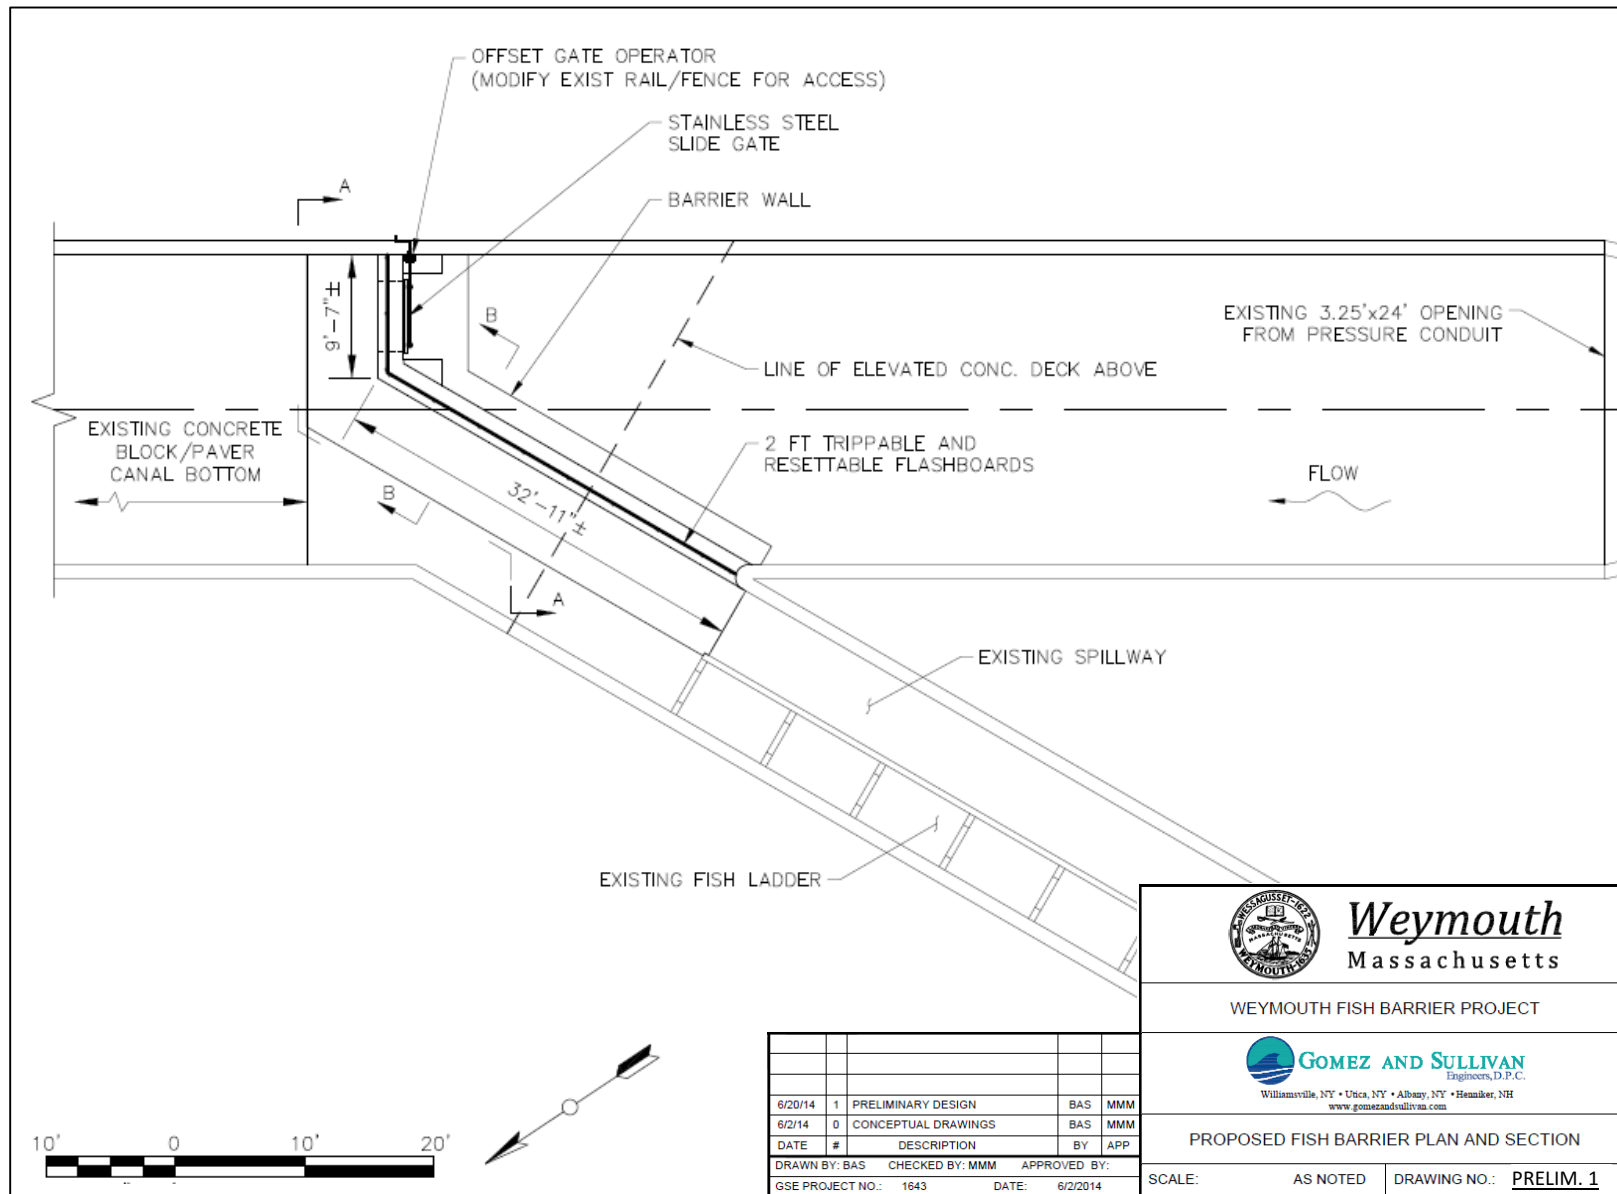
Concept Design Alternative #1 – One Gate
